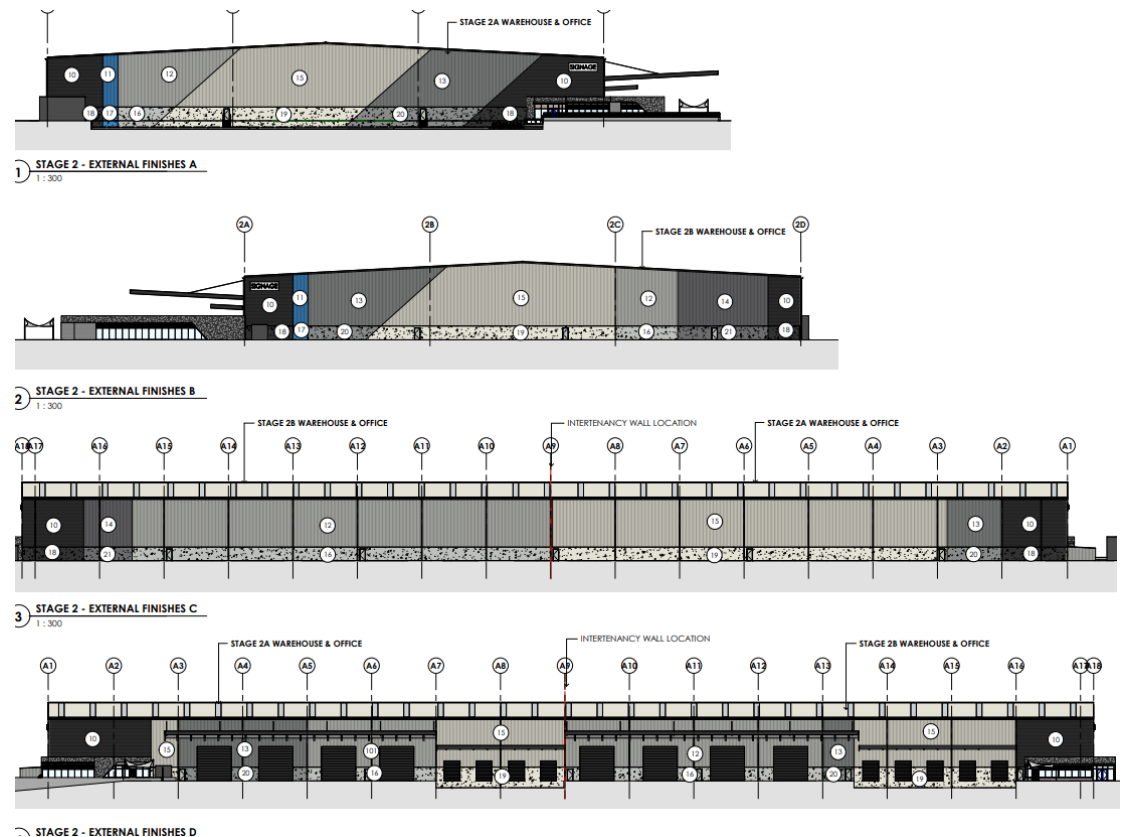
| Stage 2 Warehouse Elevations, Proposed
